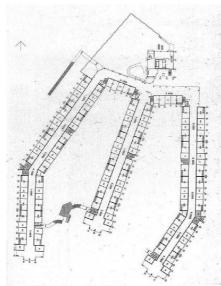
Original drawing of the lower ground floor showing garages and walled garden on north
